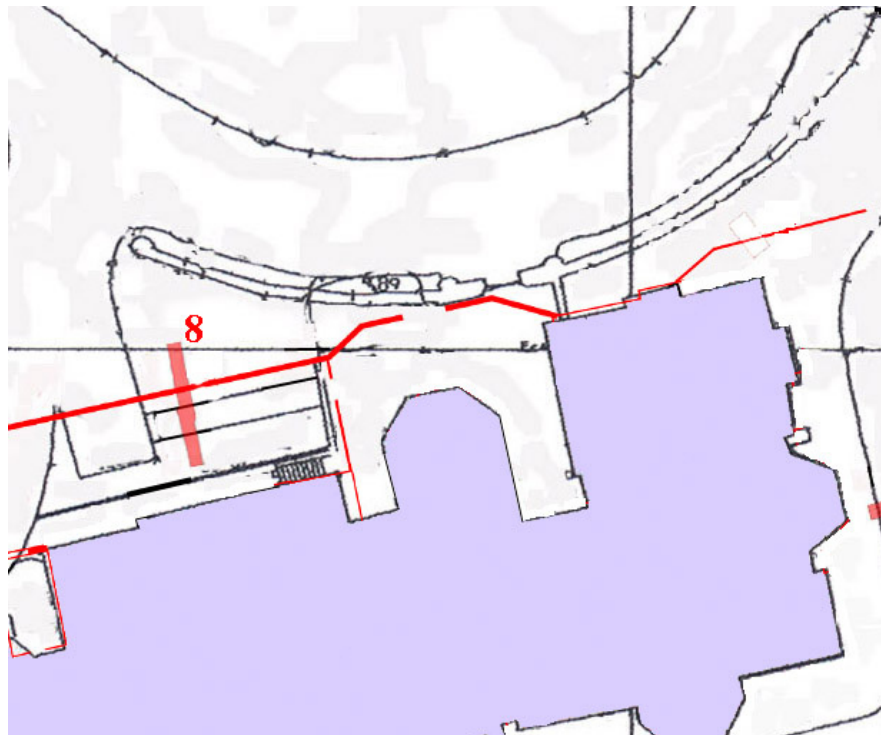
Extract from Strawberry Hill Survey showing Trench 8 in relation to existing structure and the former position of the Prior's Garden boundary wall (Based on survey plan by Inskip and Jenkins Architects, 2007).
